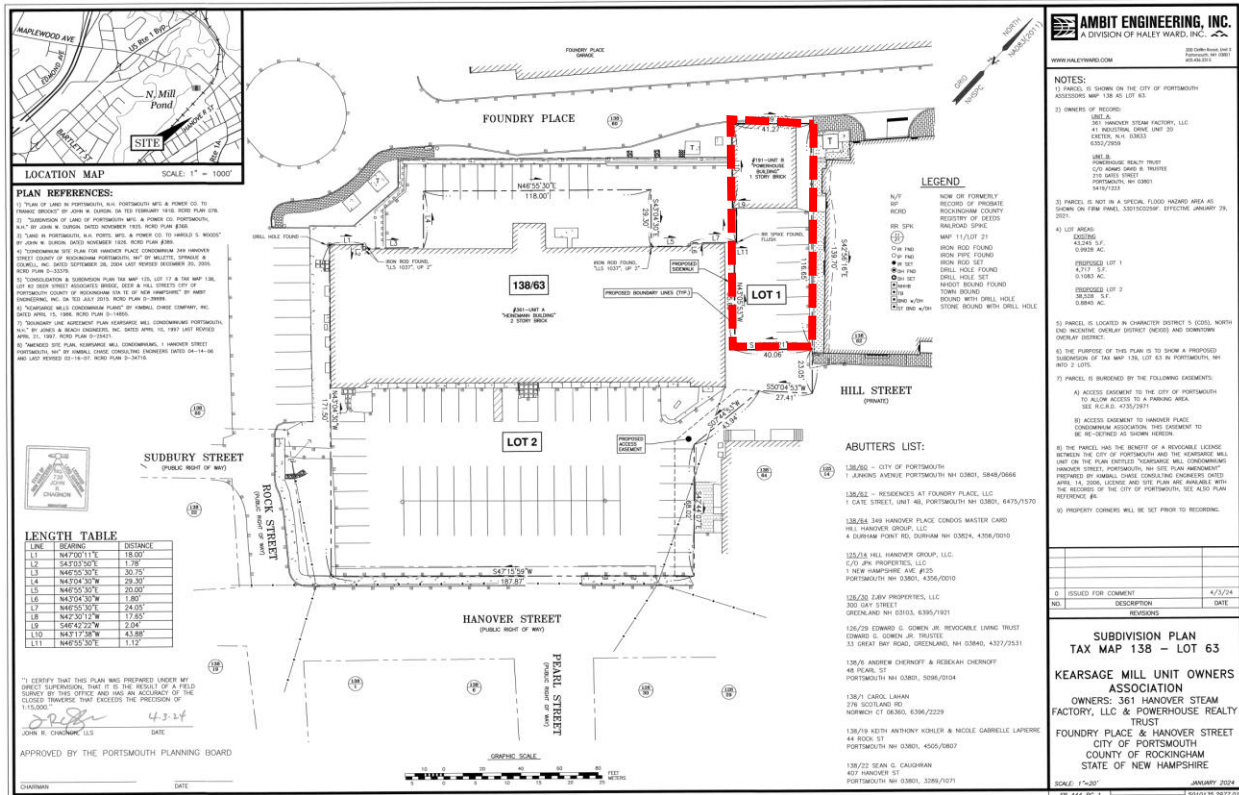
Proposed Subdivision Plan for Adams Parcel (4,717 SF)
